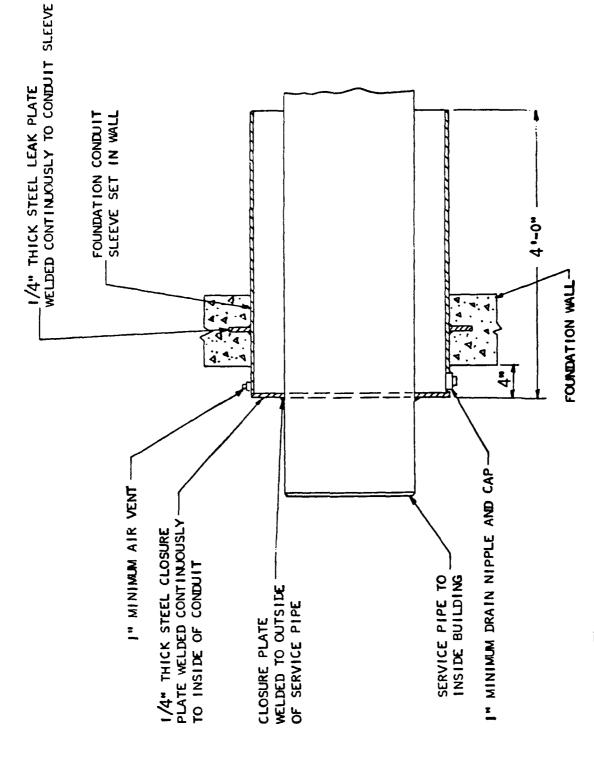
Schematic diagram of conduit penetrating a concrete wall foundation. Used by permission, Midwesco Enterprises, Inc.
